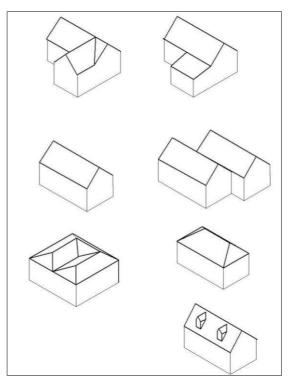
Roof forms as required by clause NOR-S5.7.2 A1
